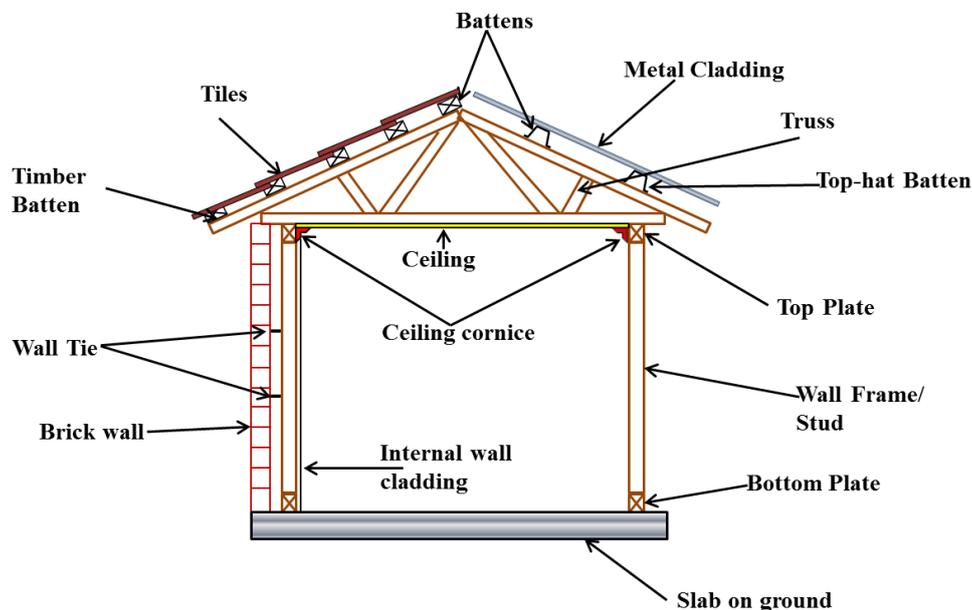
Schematic diagram of a brick veneer contemporary house structural system.
